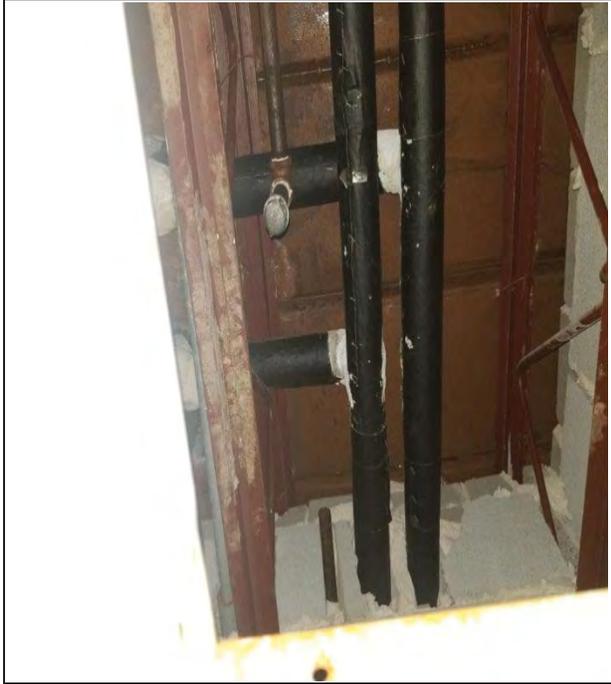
Parged pipe fitting found throughout the building. 50% Chrysotile.
